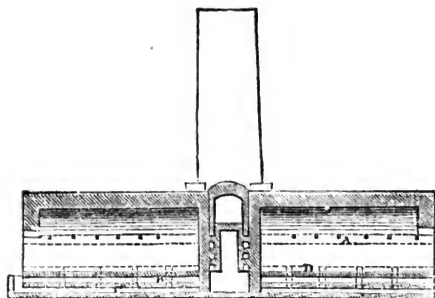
Coke-Oven. Longitudinal Section at E F, Fig. 90.
